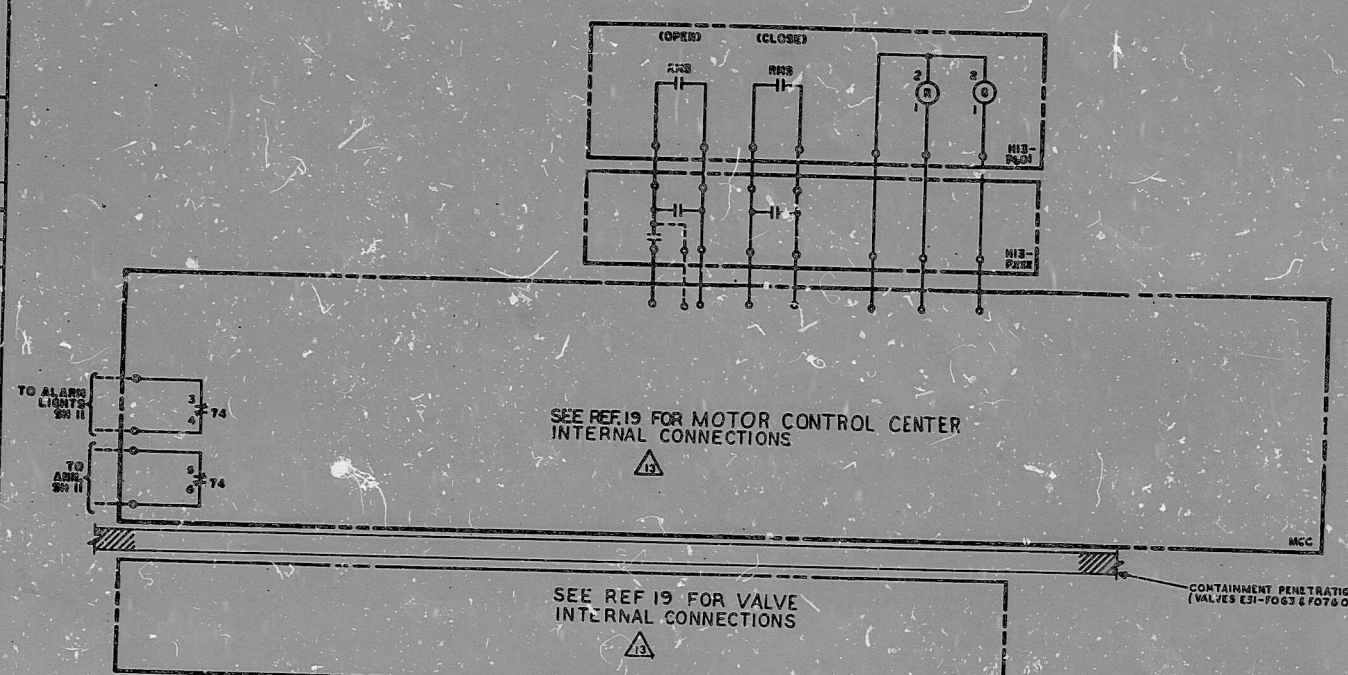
TYPICAL MOTOR OPERATED VALVE AND MOTOR CONTROL CENTER
